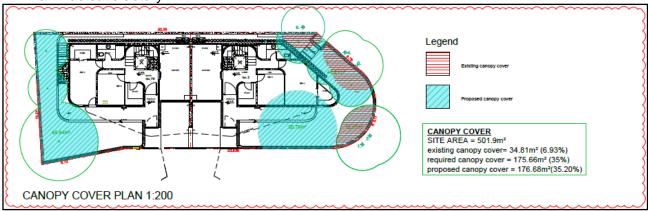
Further Amended Tree Canopy Calculations. Source: Amended Landscape Plan Rev B
